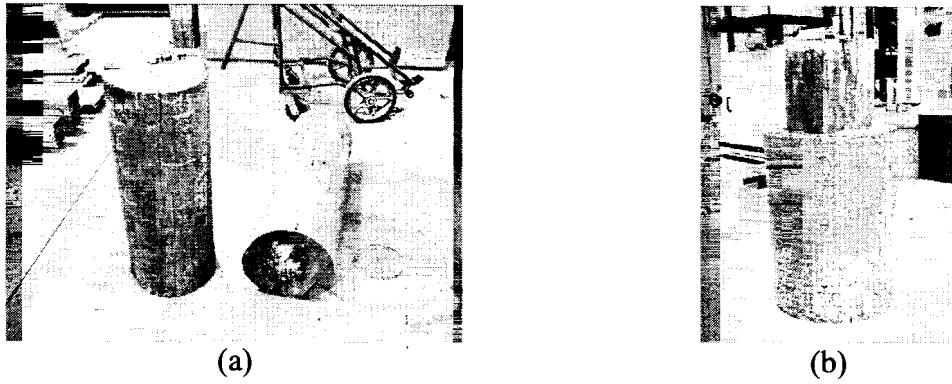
(a) Undamaged Wood Pile Sections, (b) Undamaged Wood Pile Section with FRP Composite Shells and Cement-Based Grout (Repair System A)
